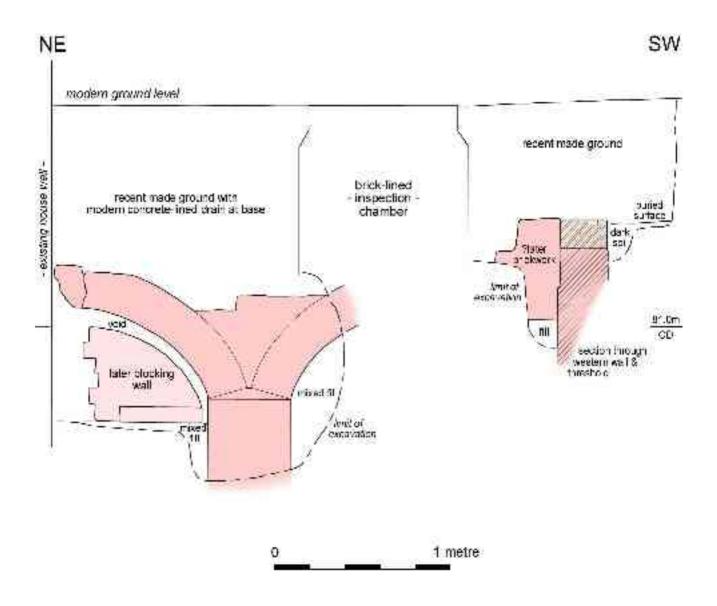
North-facing elevation across the two parts of Trench 1, showing the brick wall foundations, arches and overlying deposits (*located on Figure 3*)
